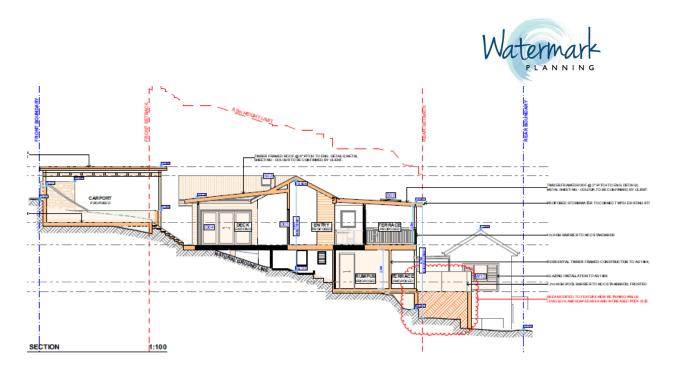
Extract from Proposed Cross Sections – Cross Section (MOD10) - area to be modified in red bubble
